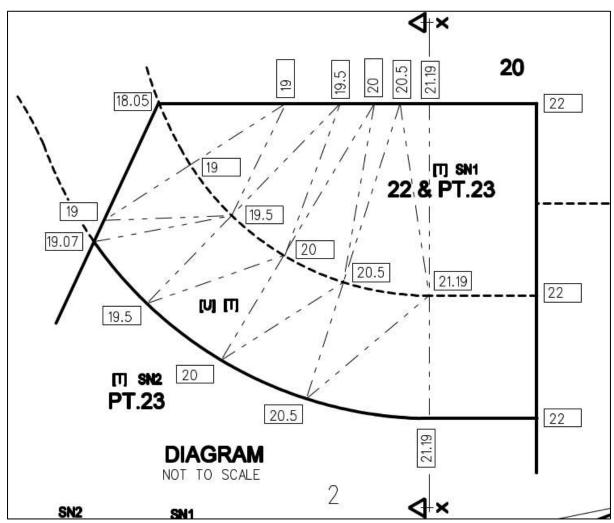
A closer diagram of the proposed Stratum lots – pt. 22 & pt. 23 in Lot 100 DP 1262255, located at the south-western boundary of the site facing Parramatta Road.
